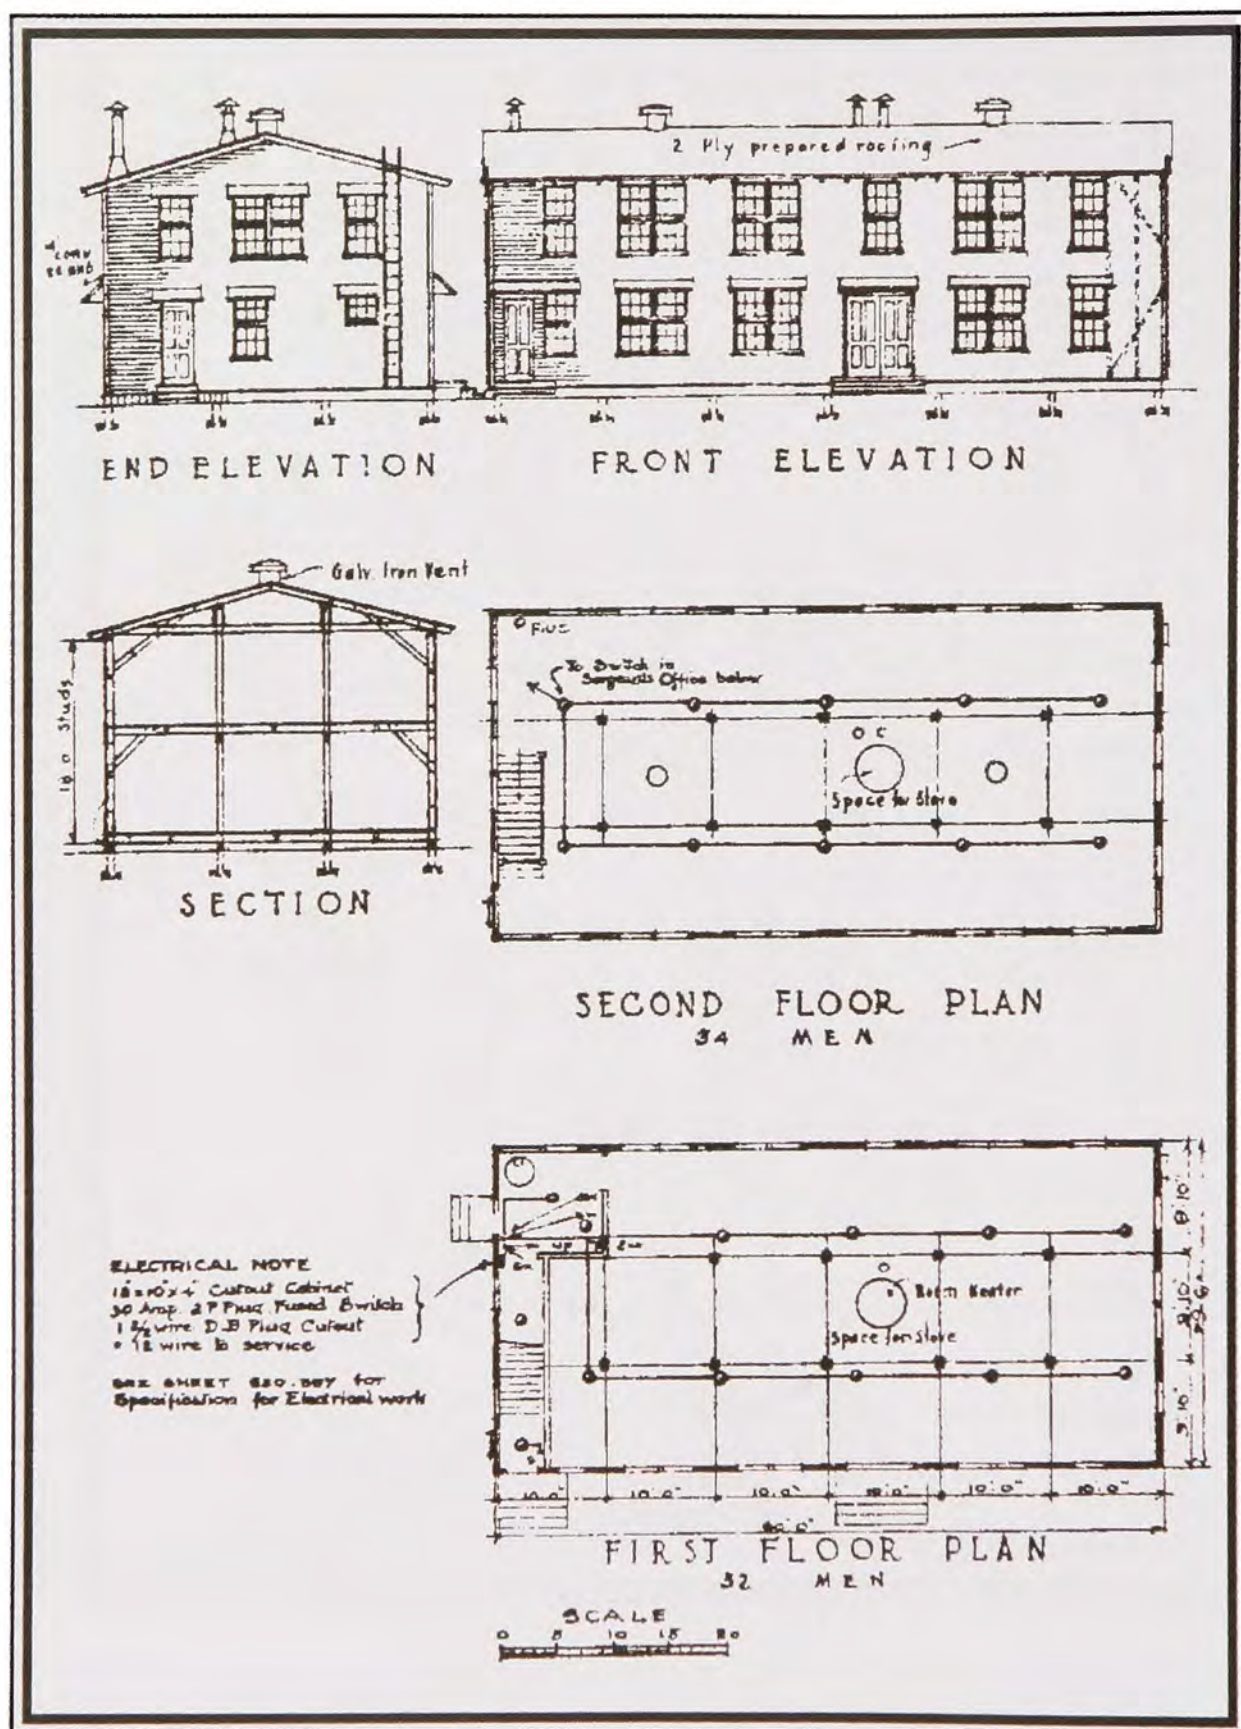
Typical buildings, 66-man barracks, Construction Division of the Army, 1918 (National Archives).
